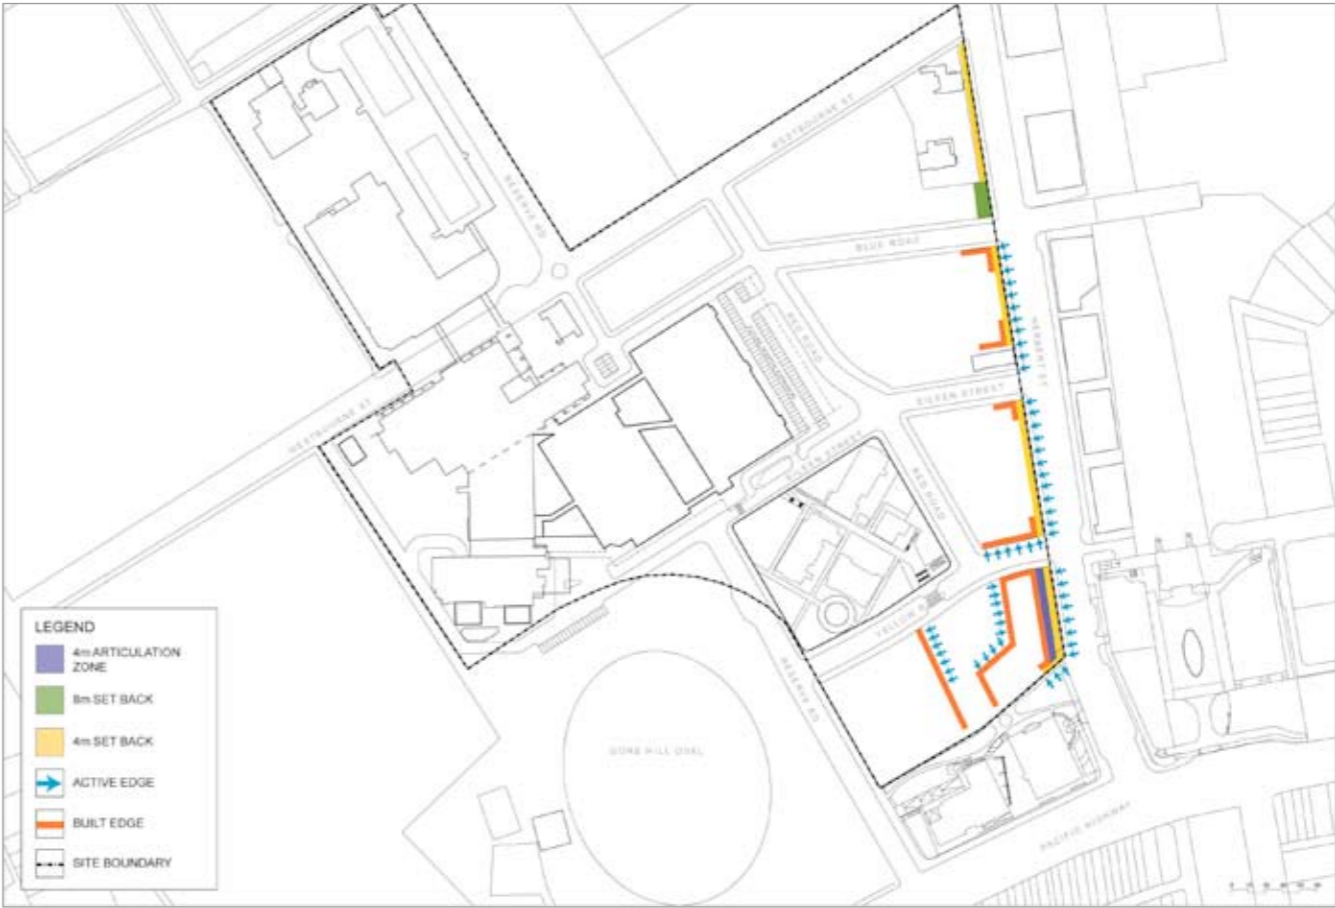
Indicative building edges / setback plan, prepared by Cox Richardson (Ref. C15.)
